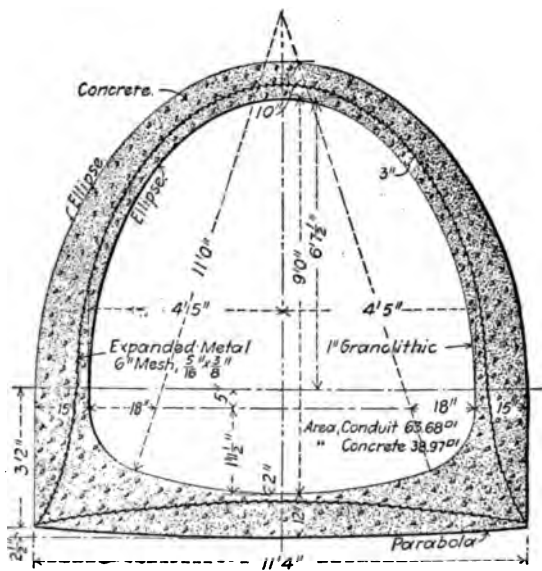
Cross-Section of 9-Ft. Concrete Sewer, Torresdale Filler Conduits.
